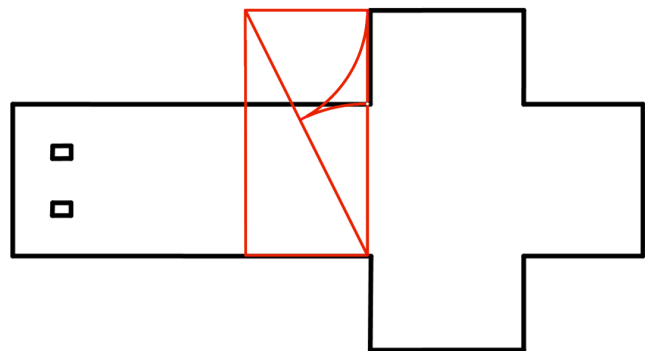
Geometric construction to verify golden ratio in Sta. Barbara Church floorplan.
